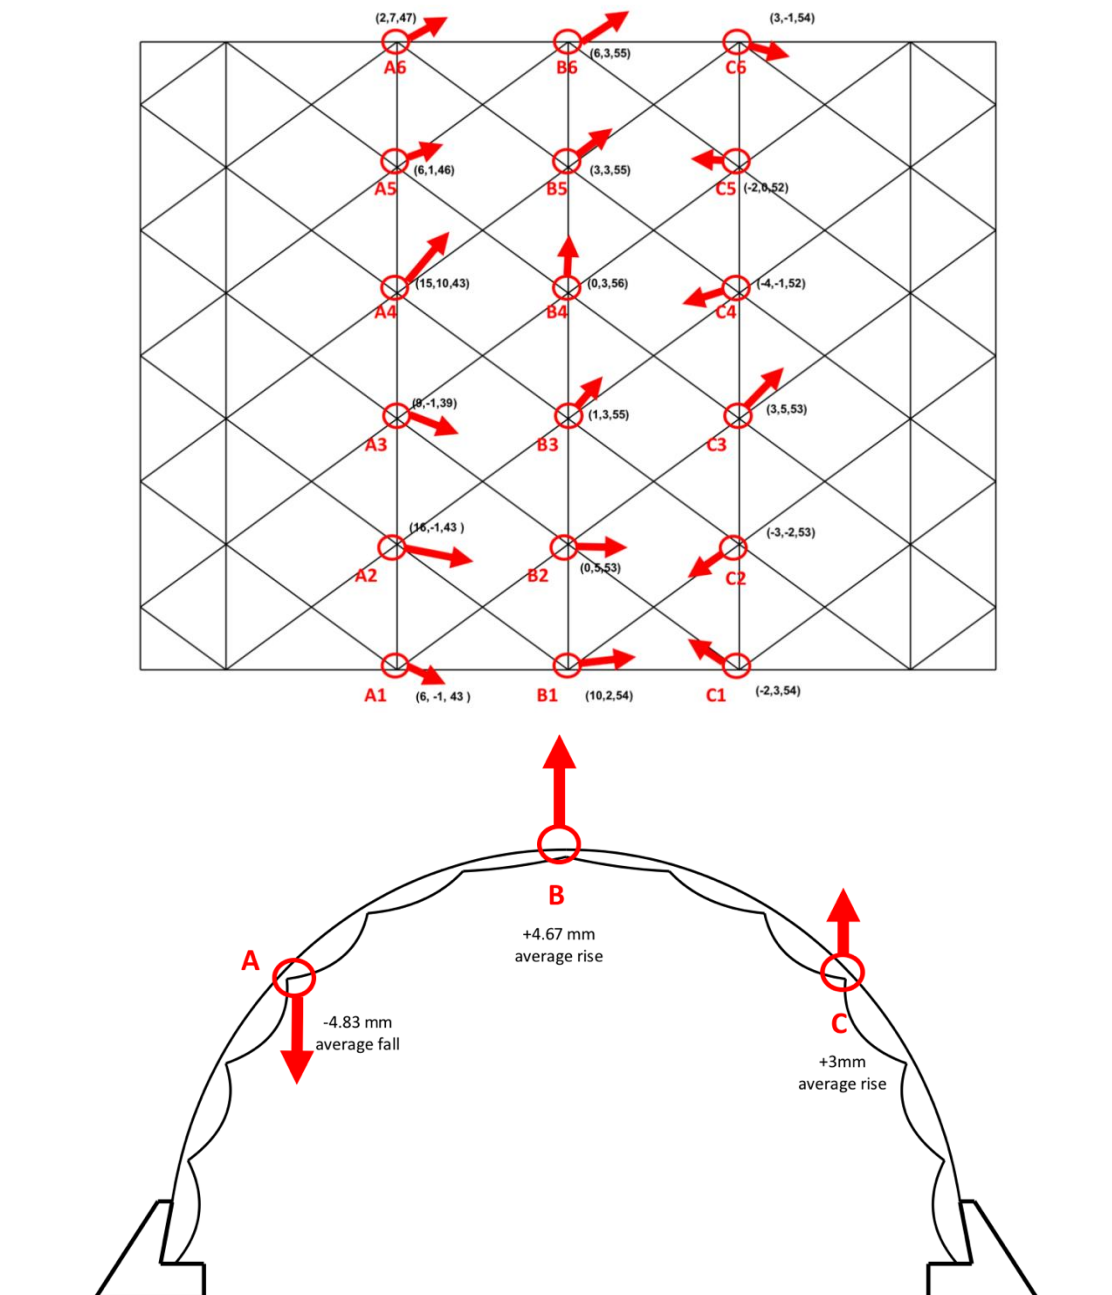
Relative Movement of Shell 1 during casting scratch coat
